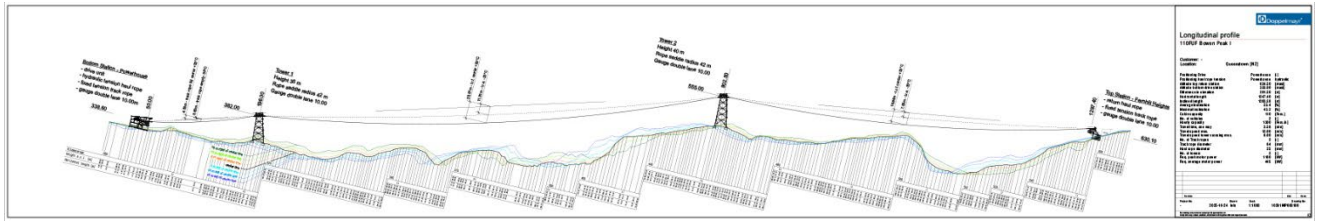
Doppelmayr Longitudinal Profile of aerial ropeway system from the Powerhouse Gondola station to the Fernhill Heights station
